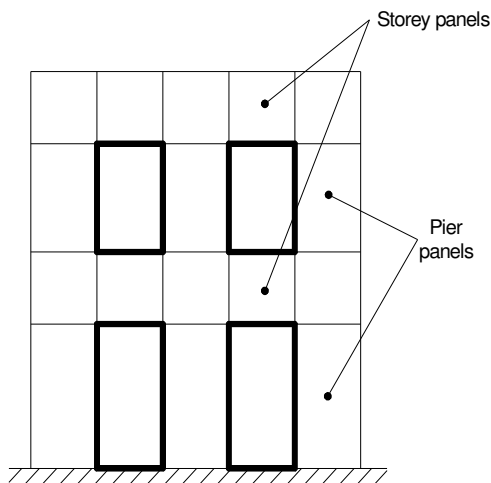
Dividing in macro-panels (pier and spandrel panels) a masonry façade [36]
